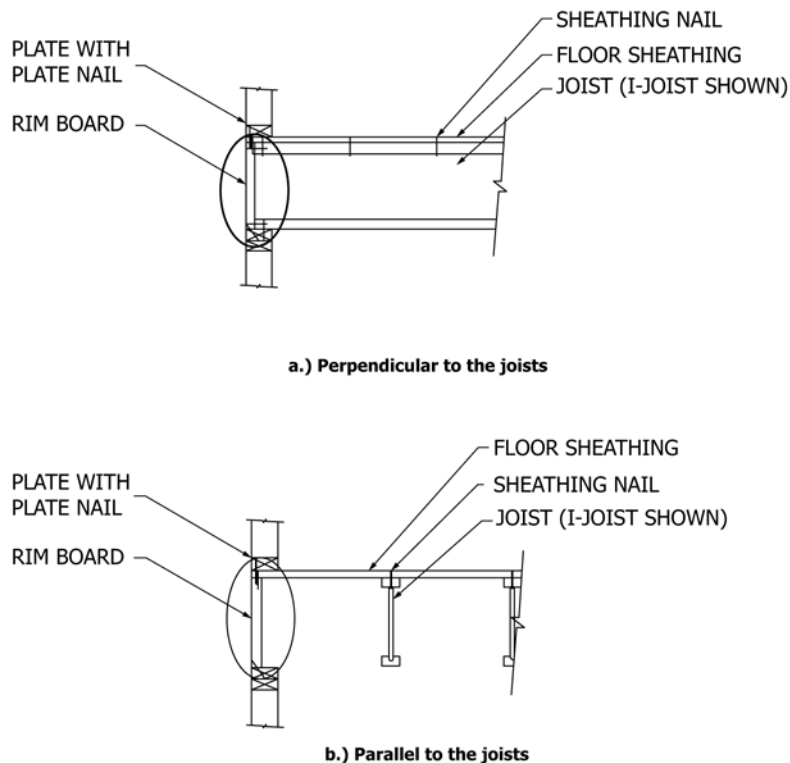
Typical Rim Board Assembly Sections for Floor Framing
